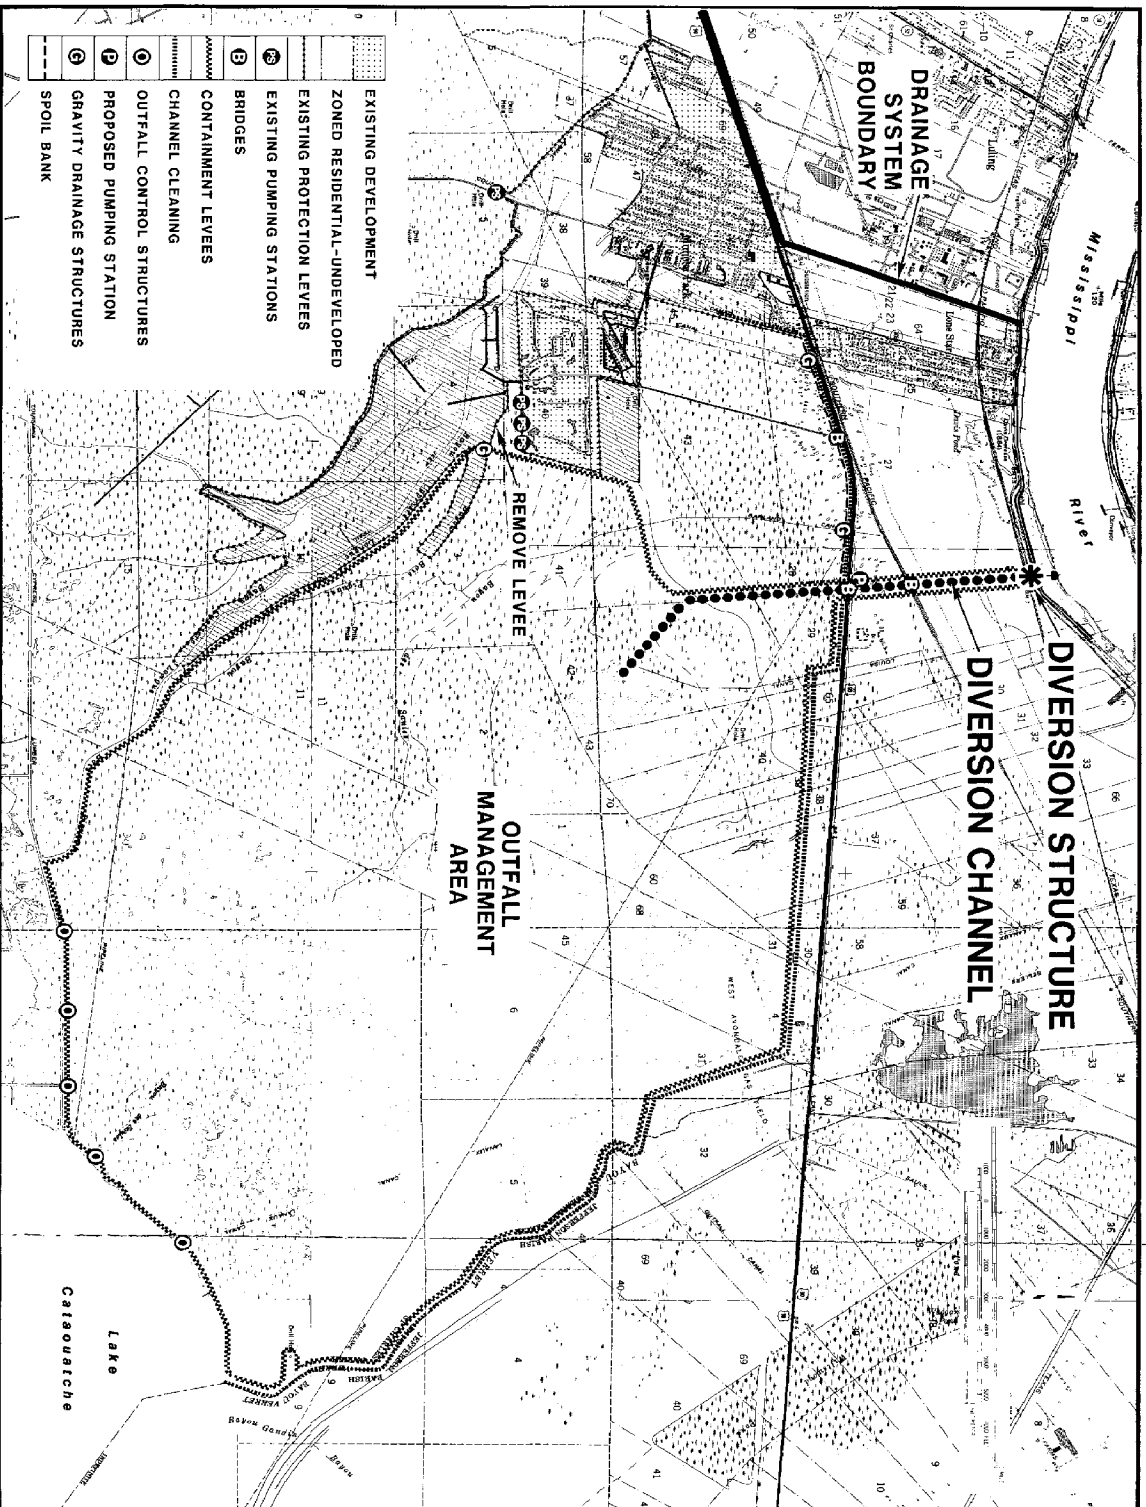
Proposed plan for a 10,500 cfs maximum diversion structure at the Davis Pond site, 118.5 AHP.
